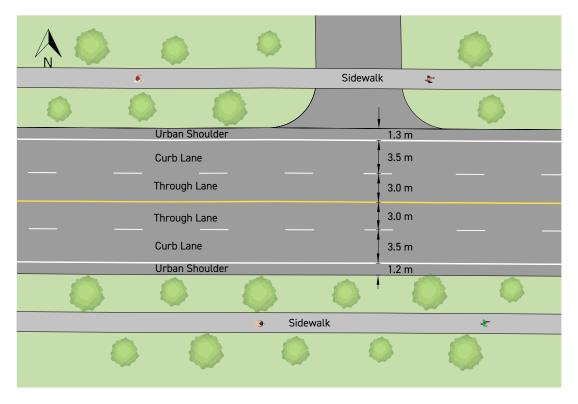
Example 7 - Configuration of Proposed Lane Widths
